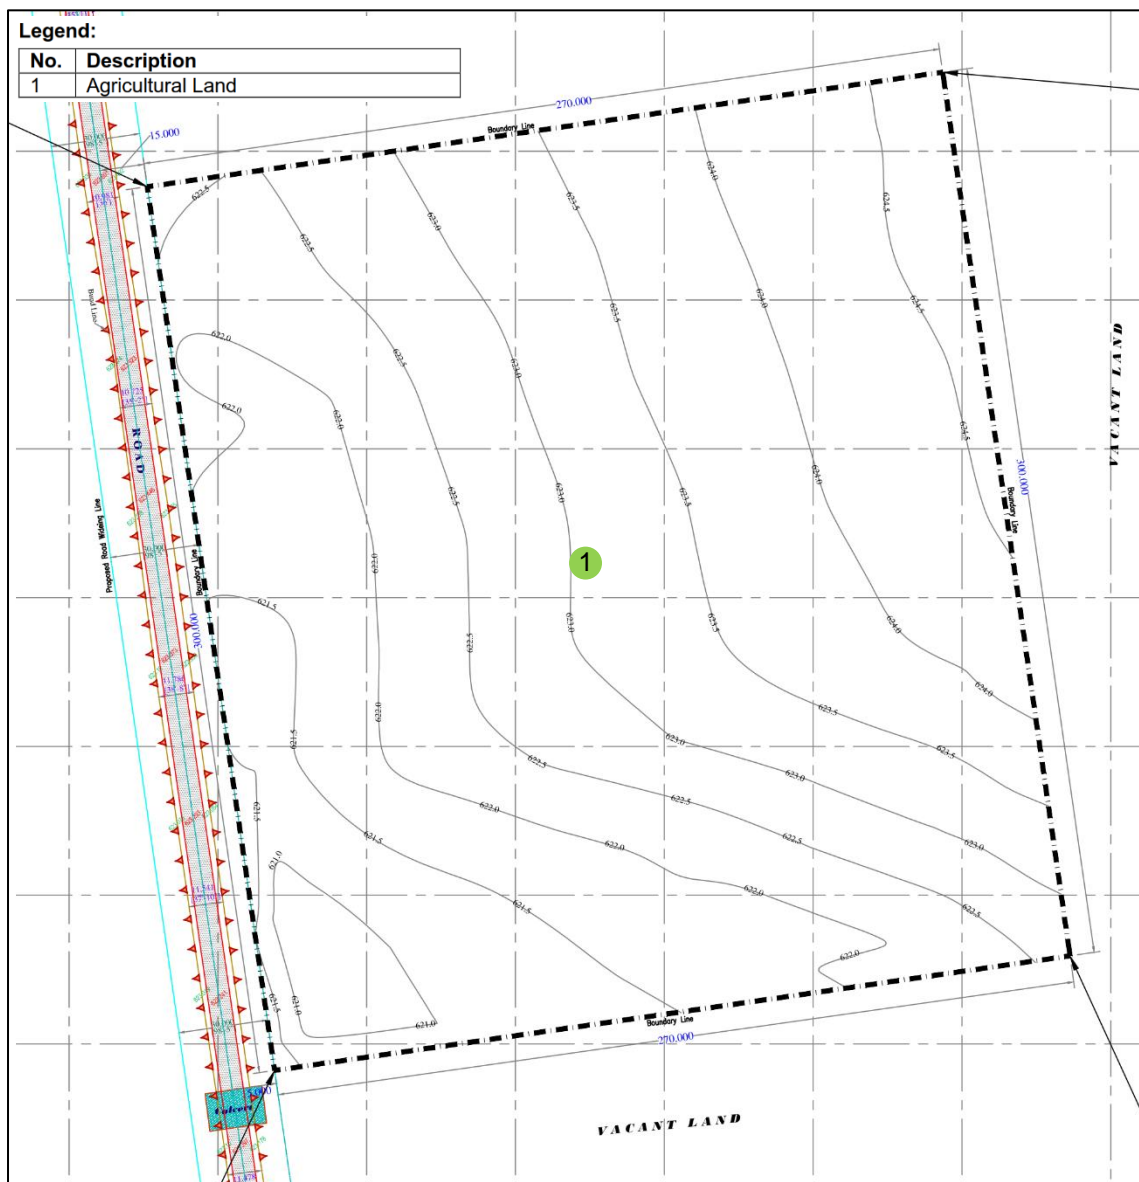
Existing features within the proposed RTC site (Source: adapted from MACE layout)
